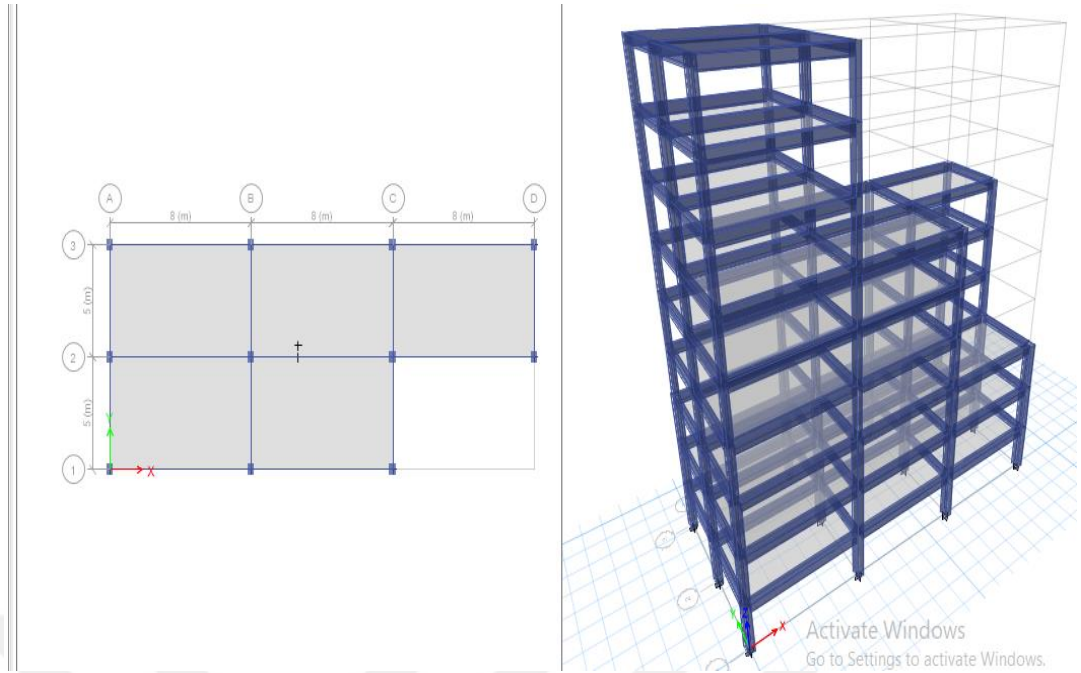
Fourth to sixth story plan and 3D of 9 story irregular rcc building
